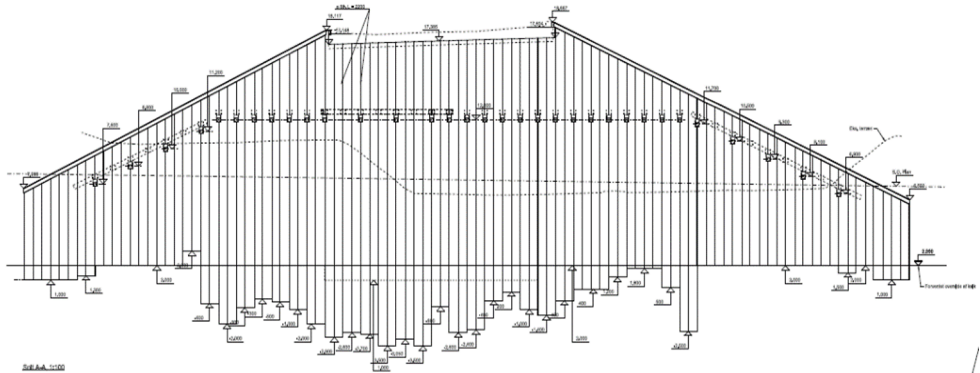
Steel sheet pile wall in the area of the bridge structure.
